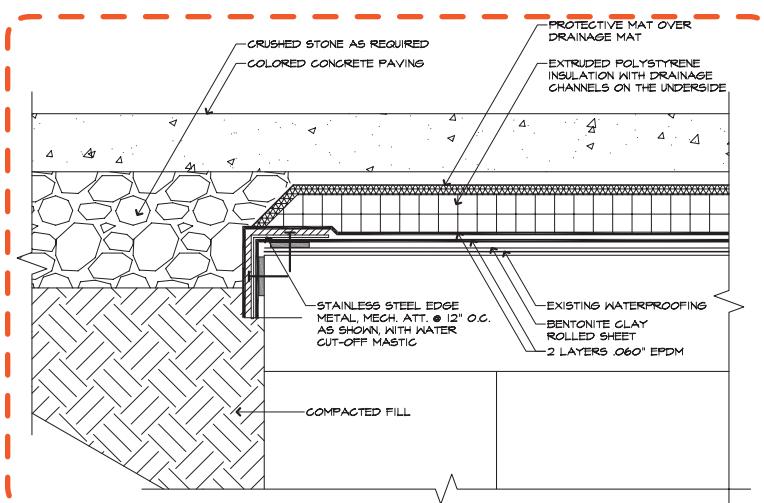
Detail 5D - Waterproofing Detail at Plaza
